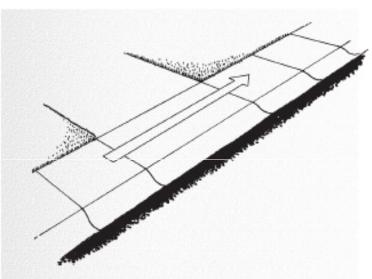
ACCEPTABLE DESIGN: Rolled curbs enable drivers to travel over the curb and eliminate the need for a driveway ramp.
